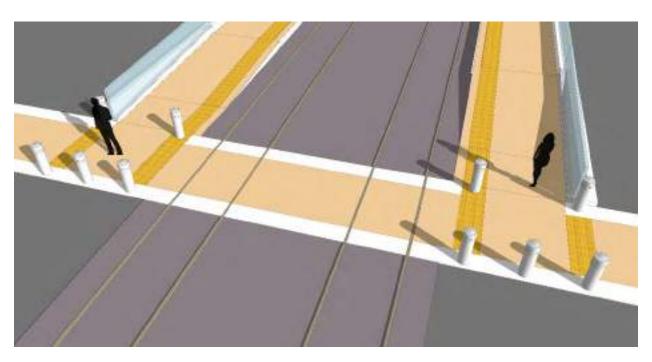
Crossing Treatment, Typical Side-Loading Platform Stops with Roadway on Both Sides
